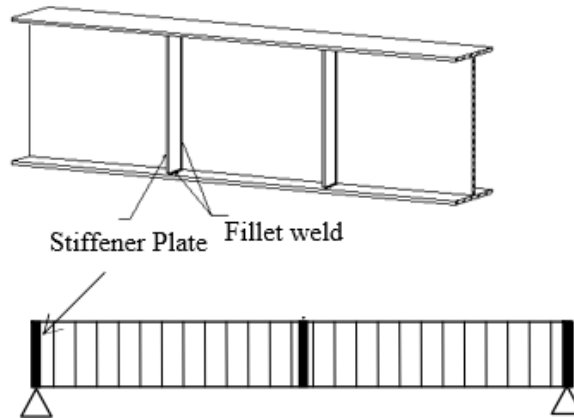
I-beam with stiffener plate (Sayed-Ahmed, 2007)
